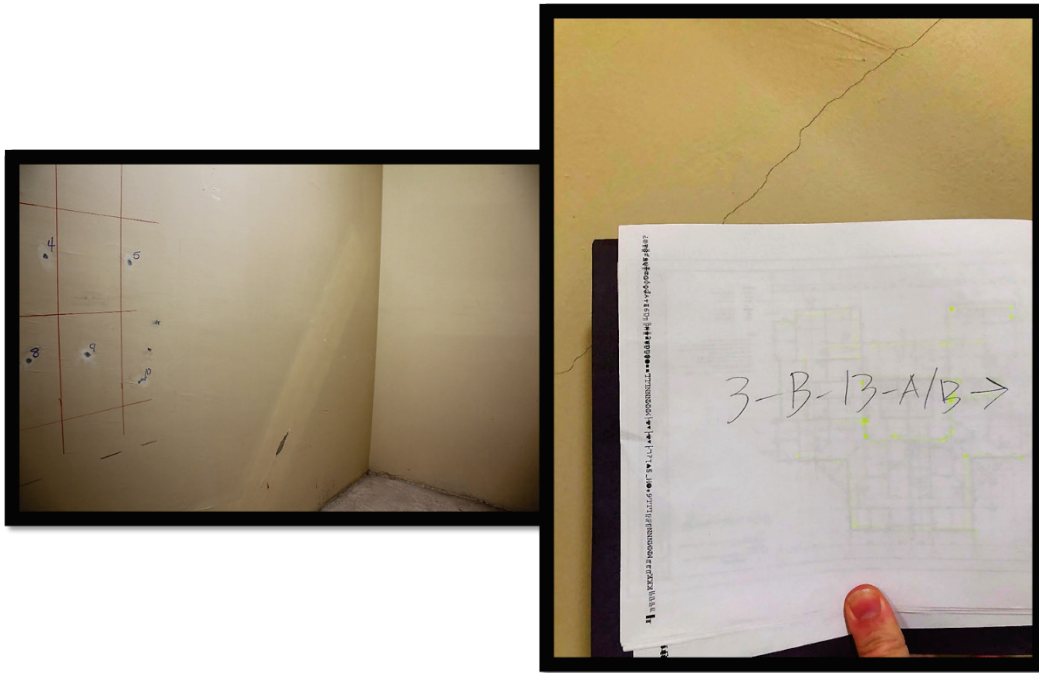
Cold joints in walls of shaft behind the elevators in Tower 3.
